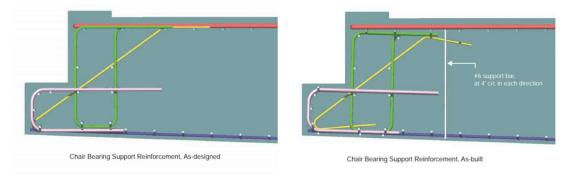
Chair Bearing Support Reinforcement
